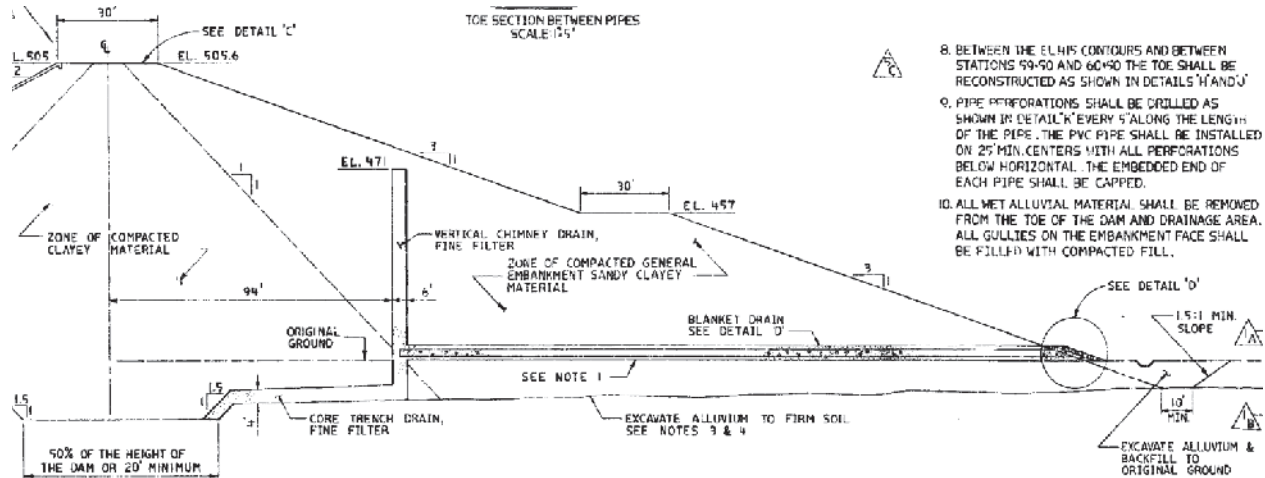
Typical Section of Ash Pond Dam Showing Internal Drainage System
